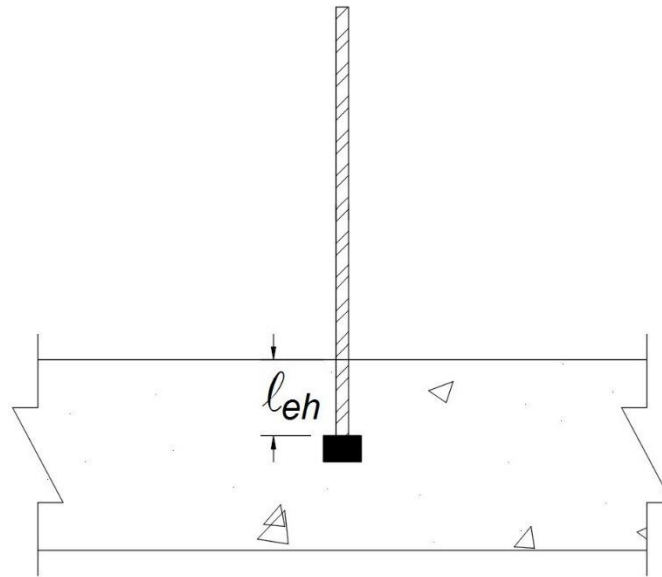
Cross-section view of shallow embedment specimen with no flexural reinforcement.
